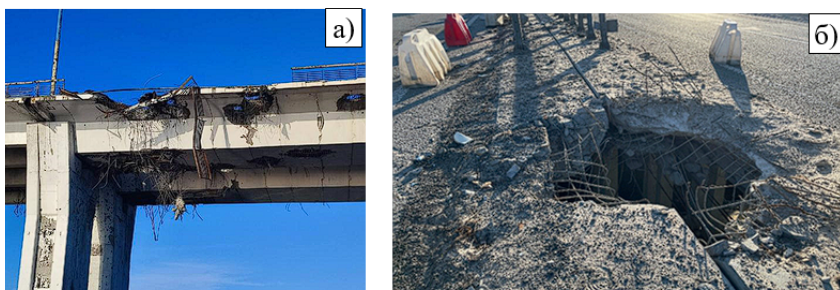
Damage to the bridge structure because of military operations [22]:
